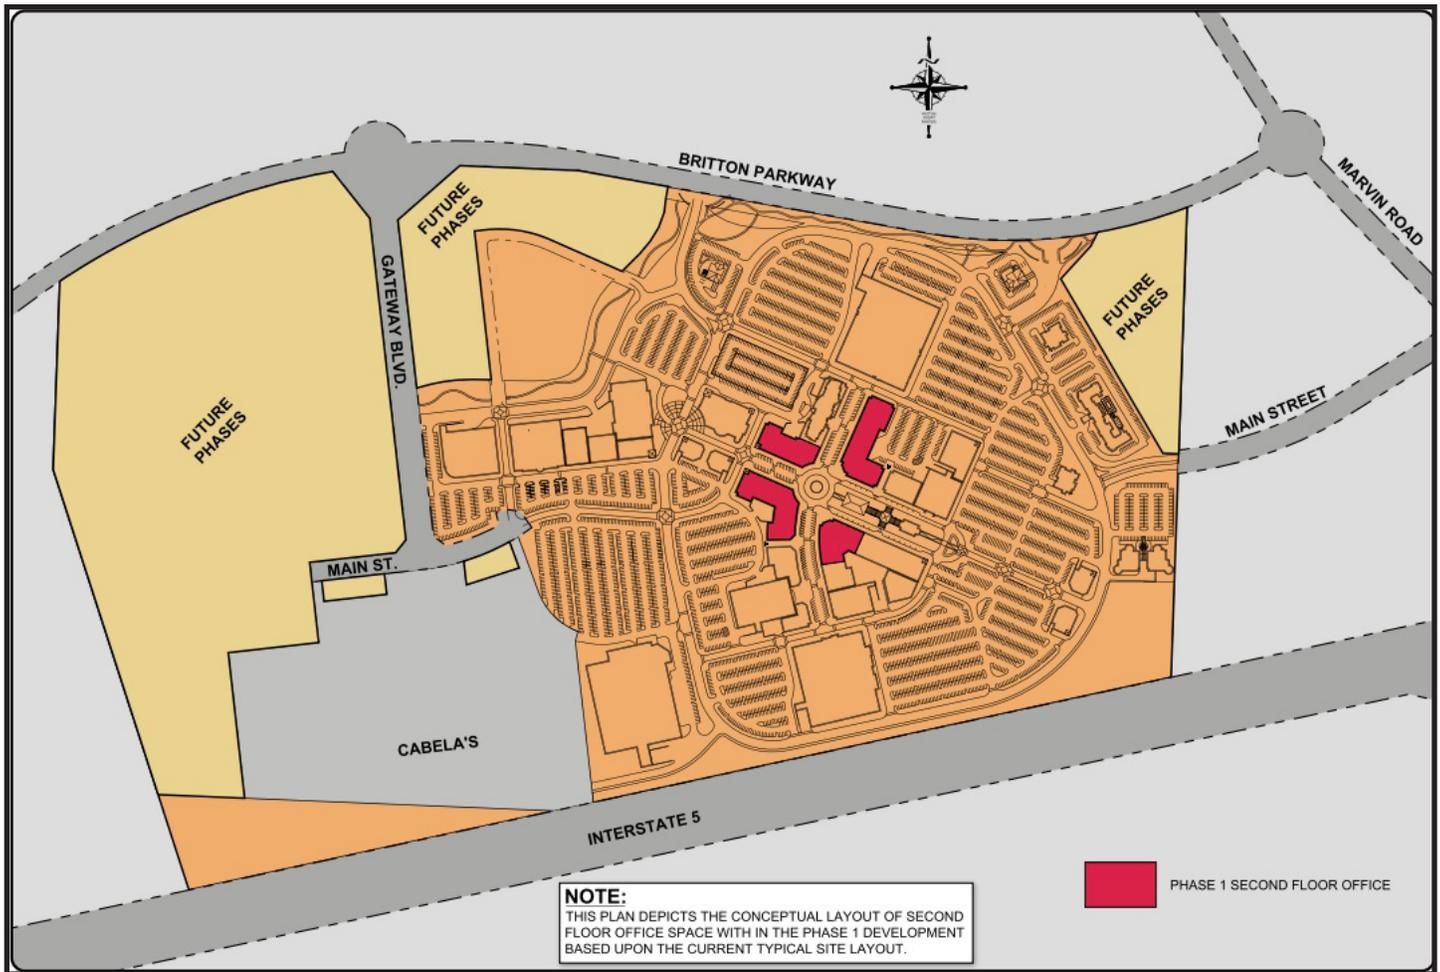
Lacey Gateway Town Center Phase 1 above ground floor office uses conceptual plan
